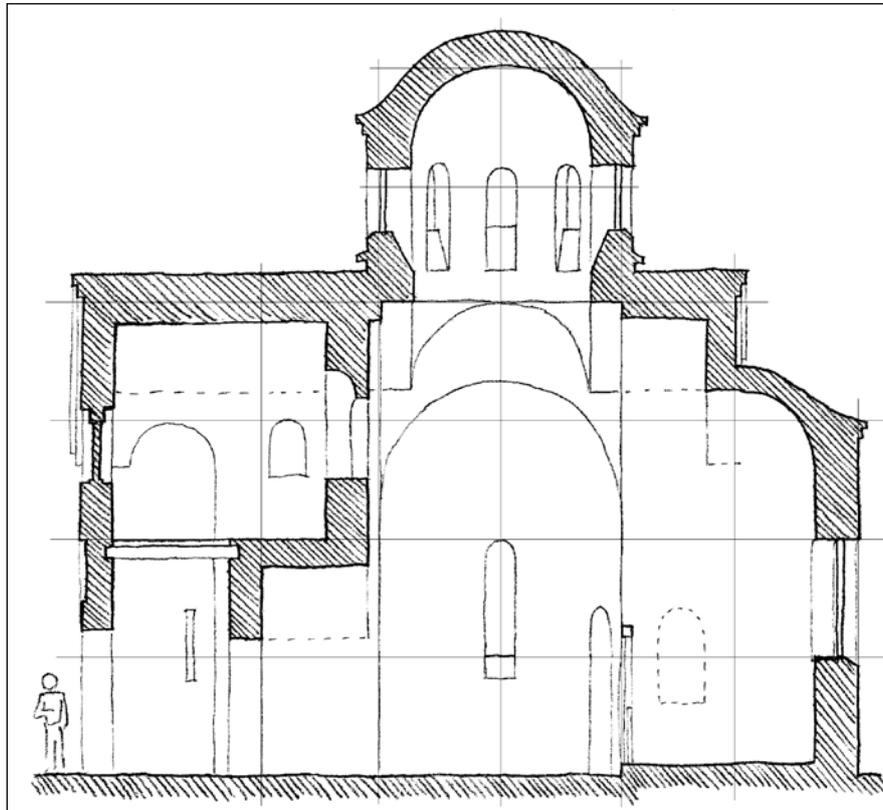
Hypothetic reconstruction of the church, longitudinal section looking north (drawing: author)
